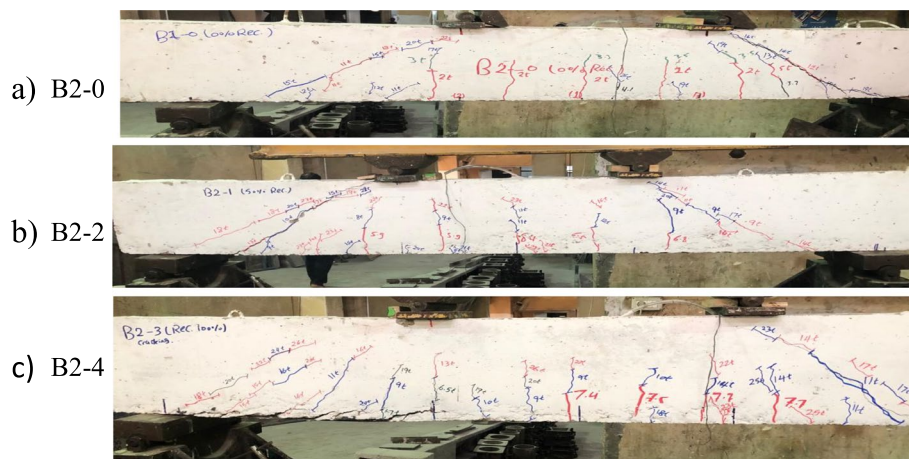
Cracks pattern for beam 2-0 using CFRP laminate
